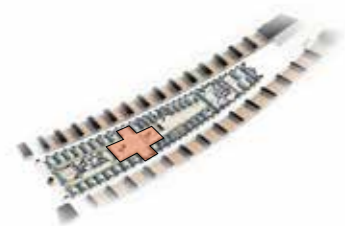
Illustrative view of the Publicly Accessible Open Space from ground floor
